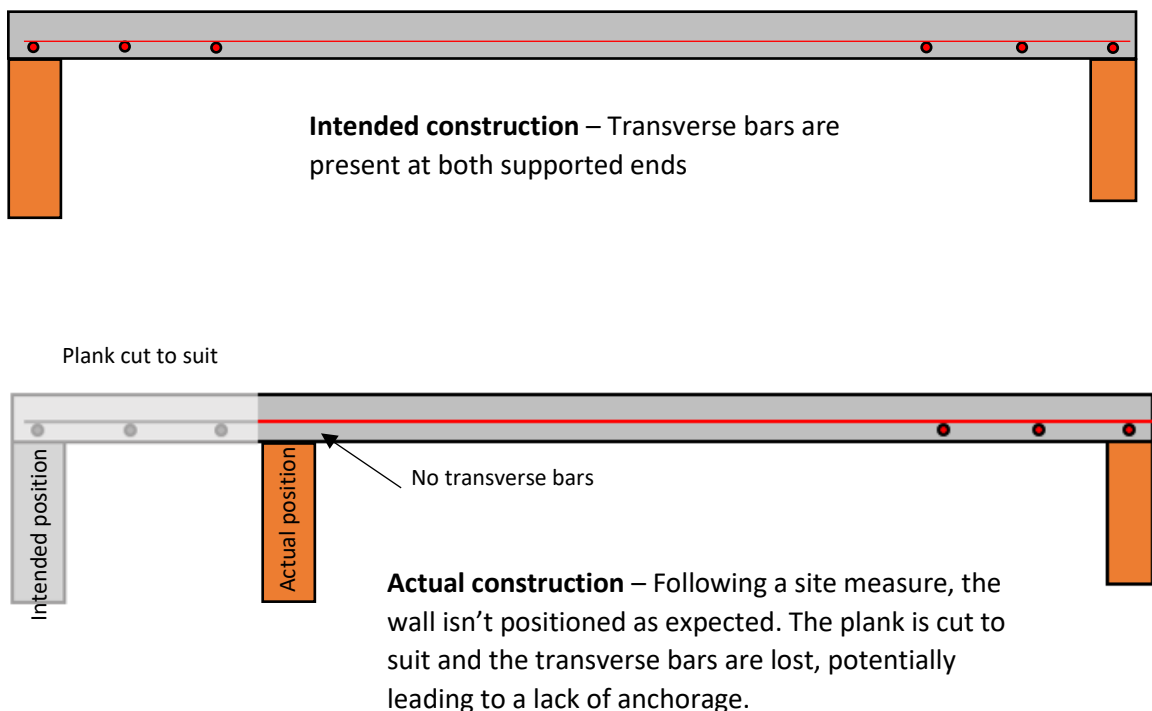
CUT PLANK LEADING TO LACK OF TRANSVERSE BARS
